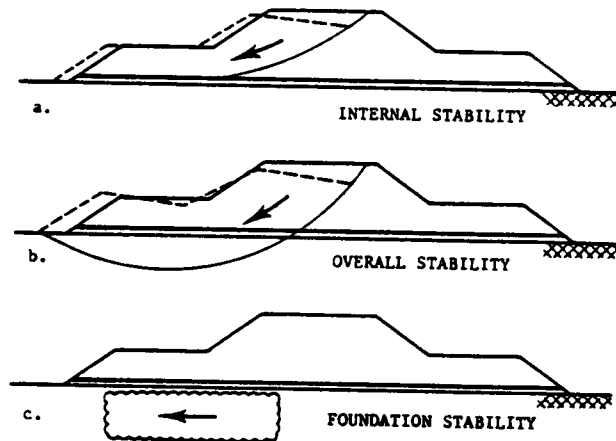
Schematic of a reinforced embankment on a soft foundation and the three principal failure mechanisms (Jewell, 1982).
